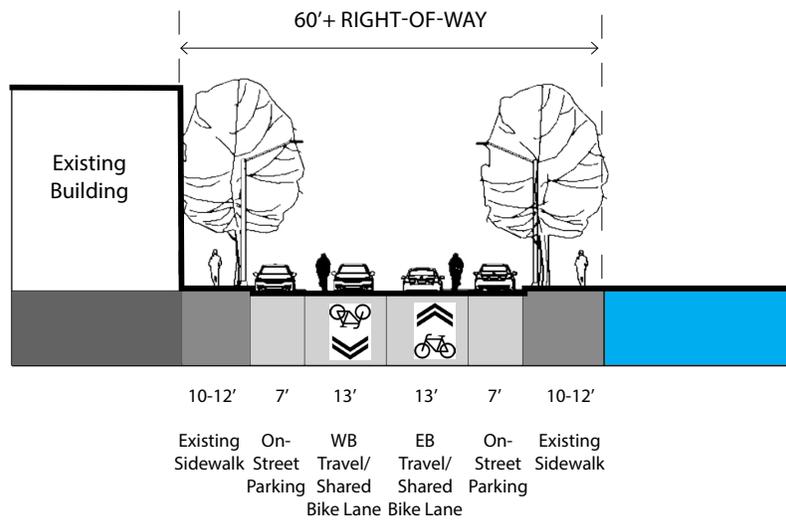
Main Street/High Street Cross-Section, at BART Entrance (Looking East)
